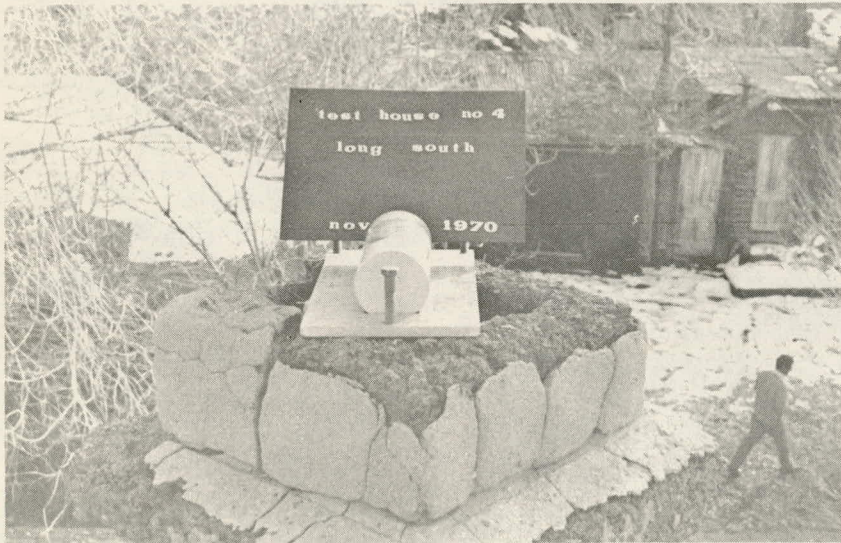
Station #4, Test House #4, seismometer location, center chimney of House #4.
